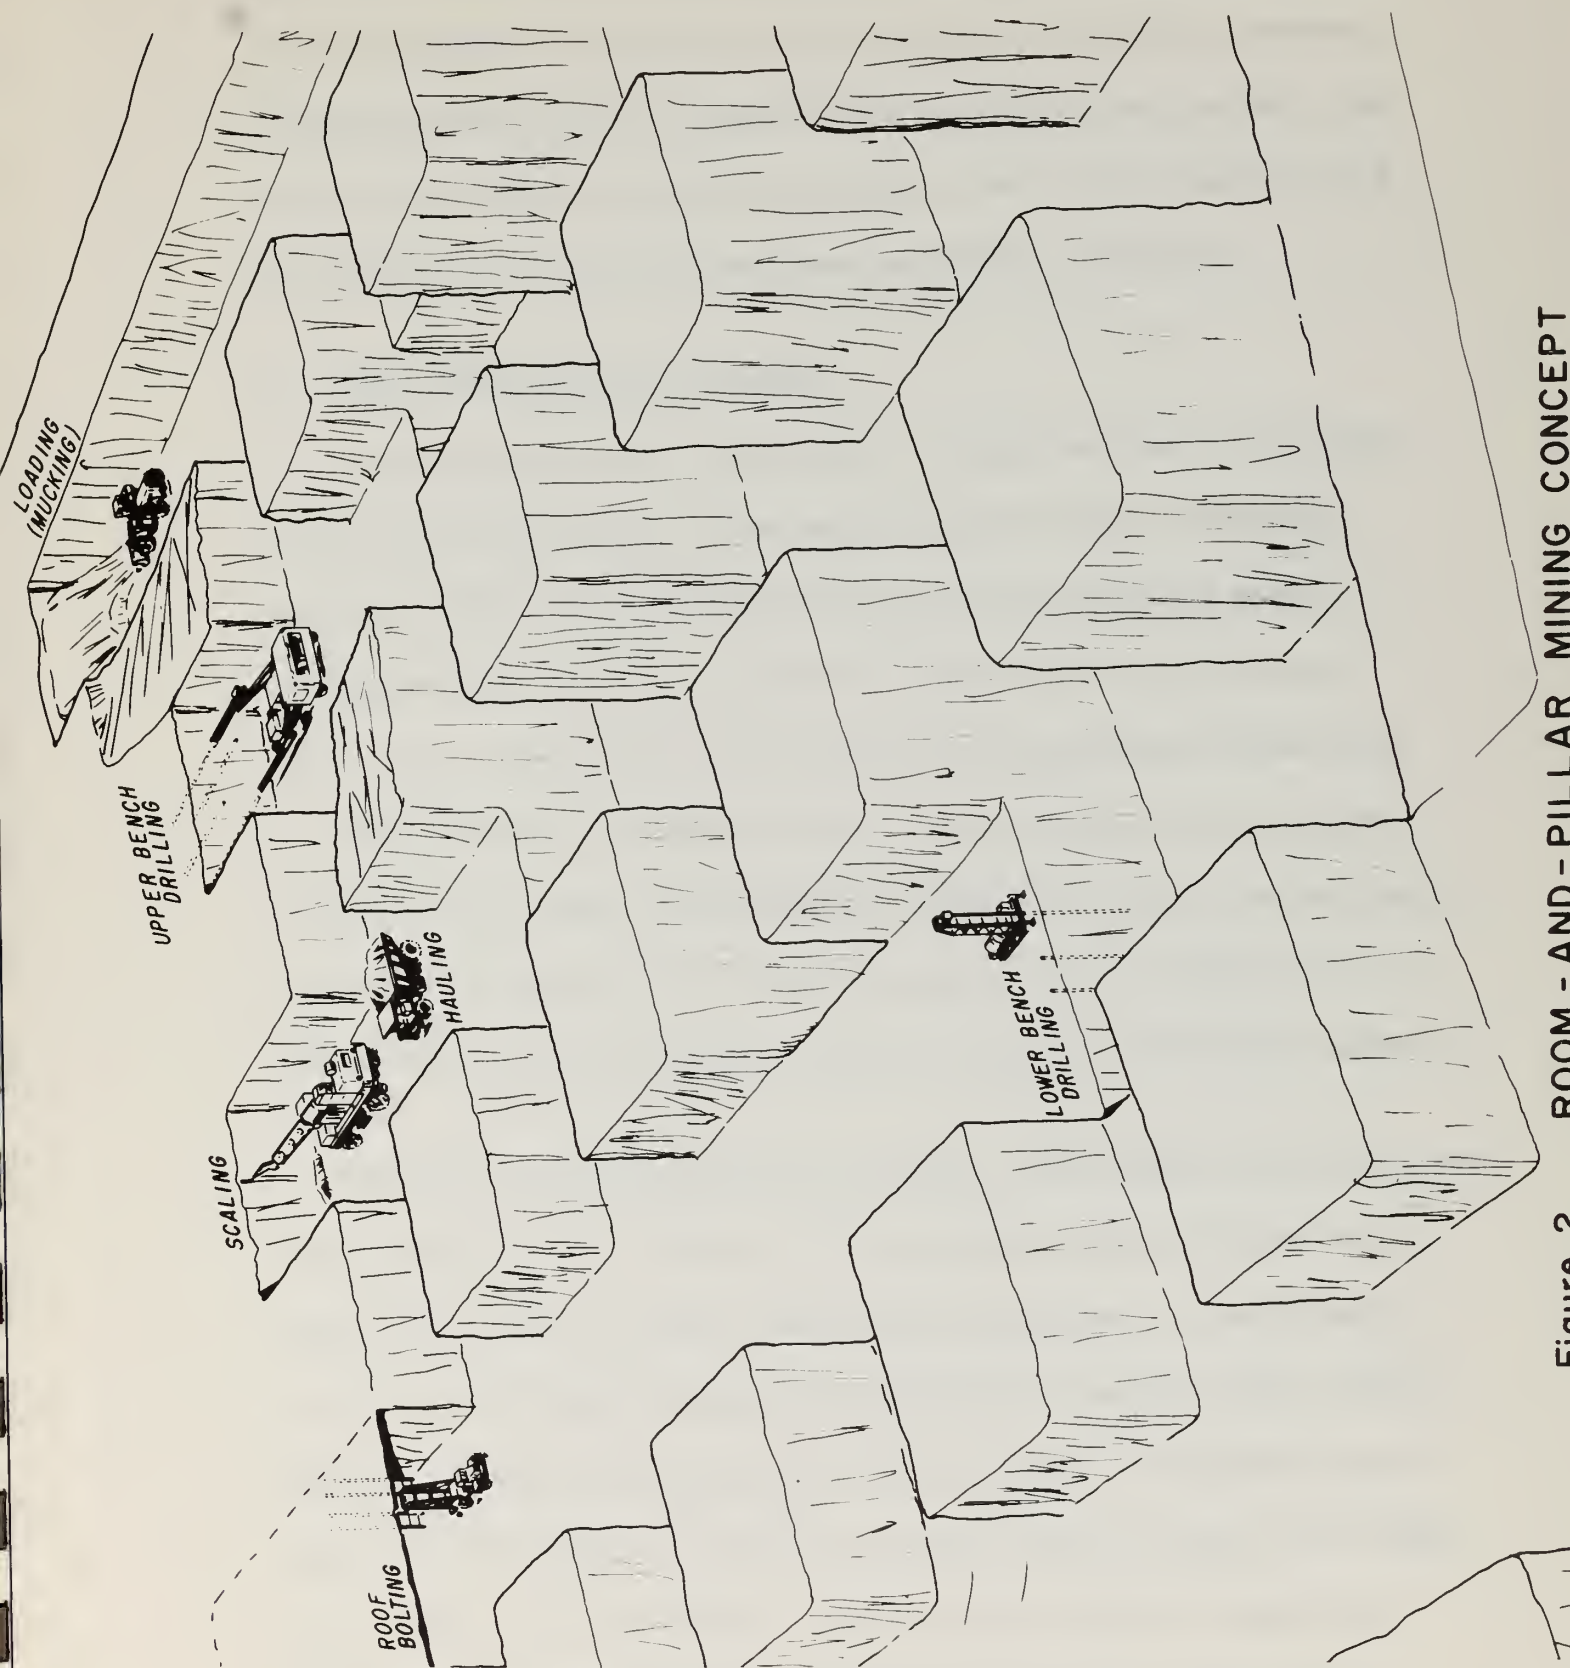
ROOM - AND - PILLAR MINING CONCEPT
